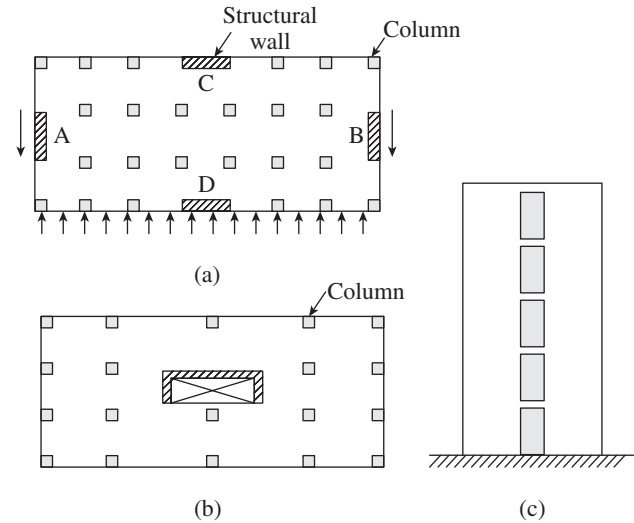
Types of structural walls (a) Rectangular shear walls (b) Structural wall around elevators and stairwells (c) Coupled structural walls
